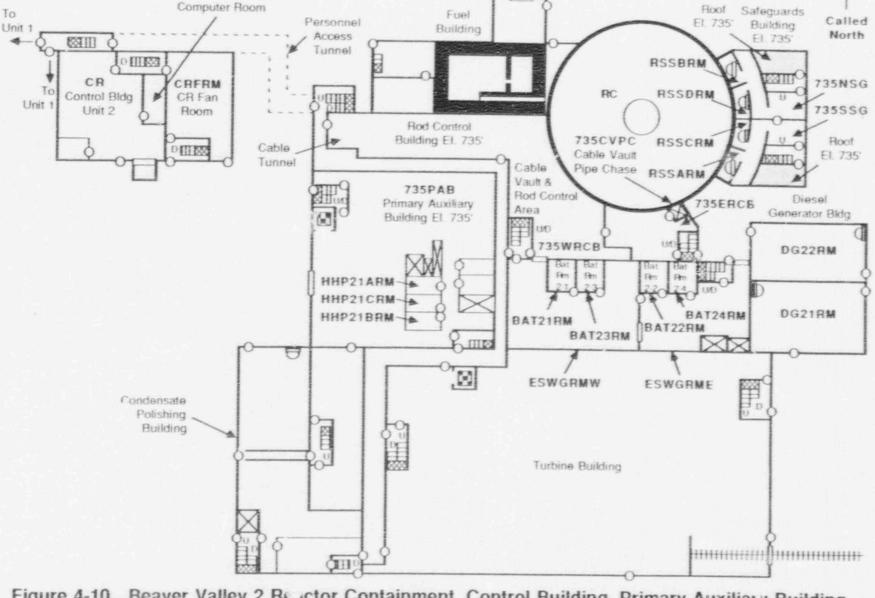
Beaver Valley 2 Reactor Containment, Control Building, Primary Auxiliary Building, Diesel Generator Building, Safeguards Building, Rod Control Building, Fuel Building, and Turbine Building (Elevation 735'6')
